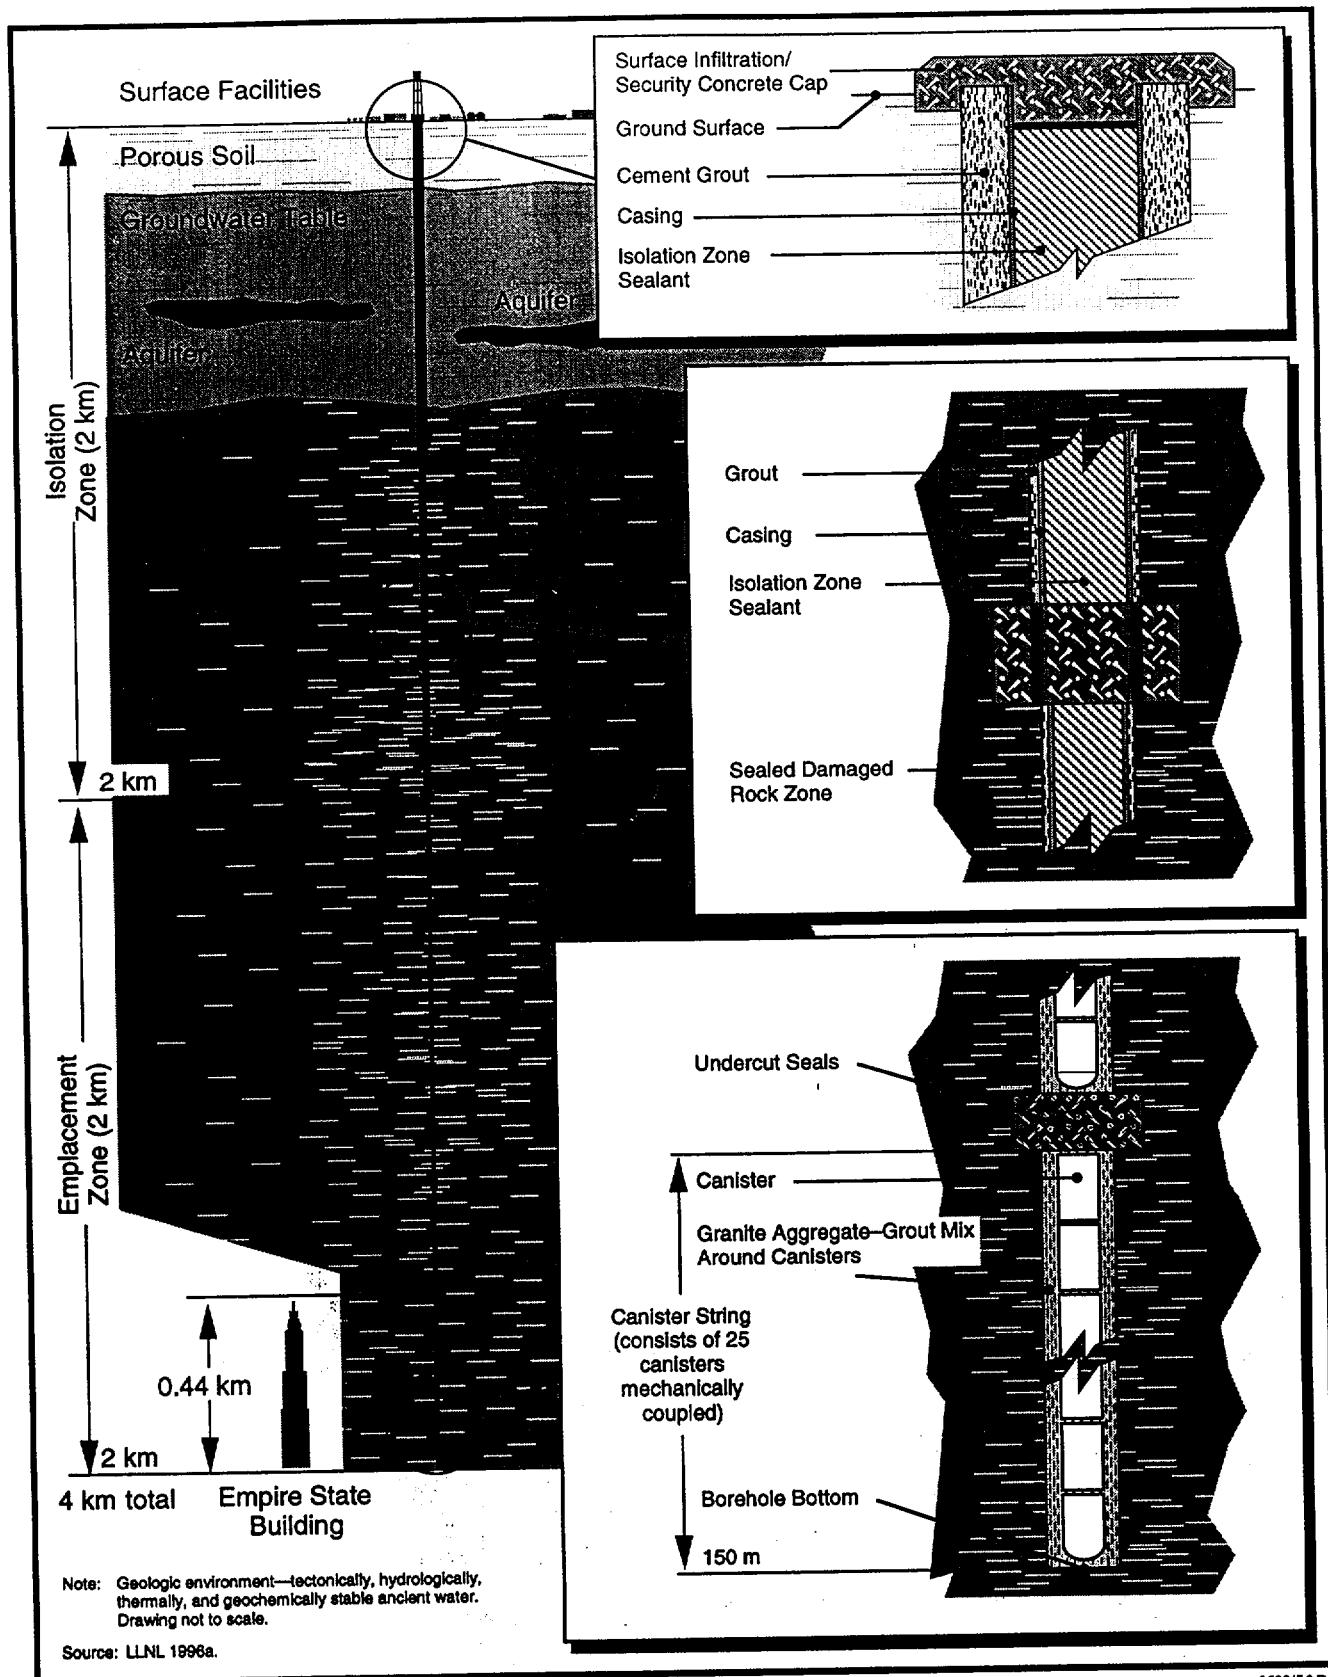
Cross-Section—Deep Borehole Typical Arrangement With Emplaced Canisters—Direct Disposition Alternative.
